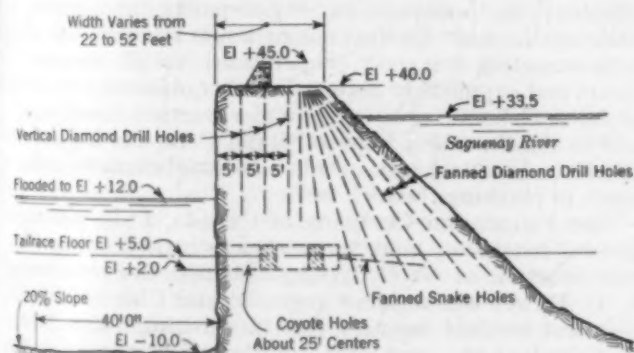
SECTION SHOWING METHOD USED TO DISPOSE OF ROCK PLUG AT TAILRACE
